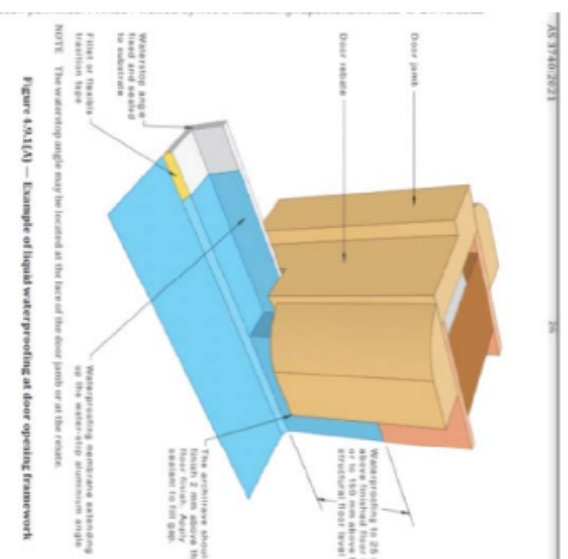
(A) — Example of liquid waterproofing at door opening framework
